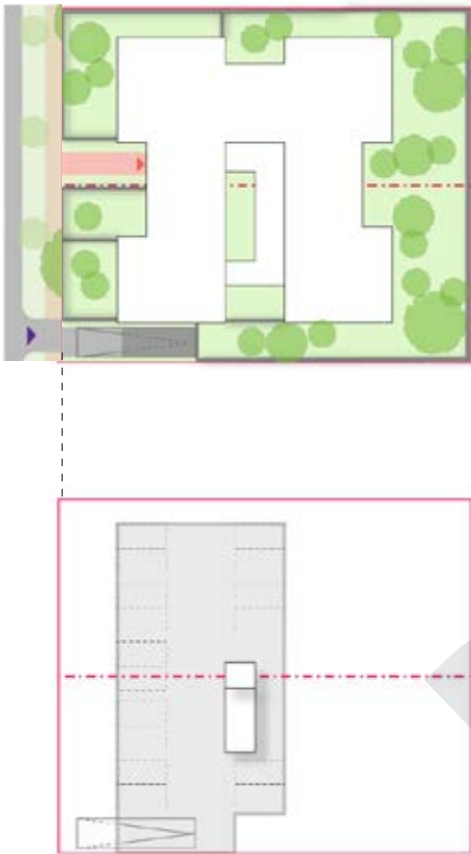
Apartments on consolidated block with shared basement parking from street. This layout maximises ground-level open space.
